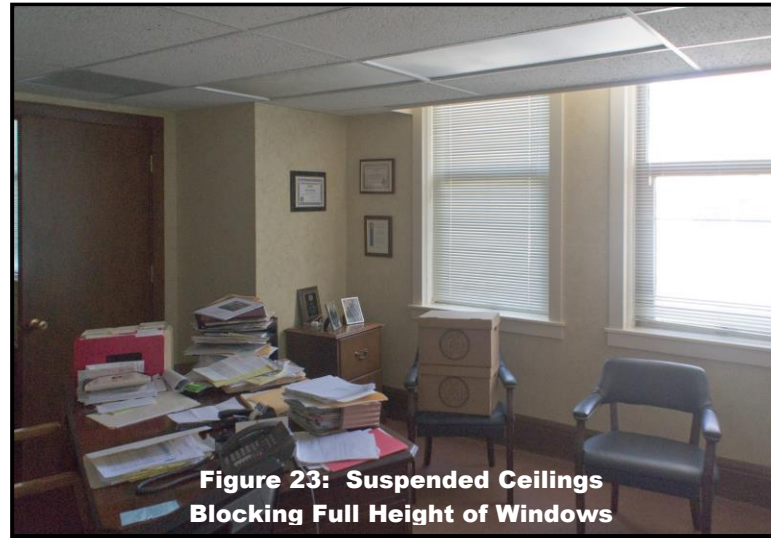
Suspended Ceilings Blocking Full Height of Windows
